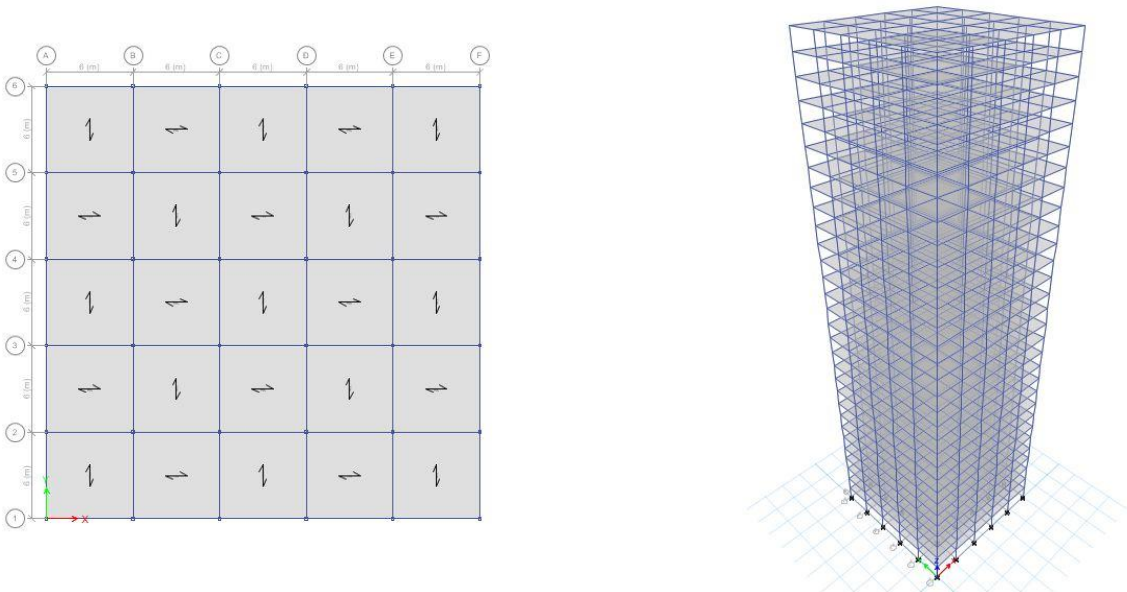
Three-dimensional view and floor plan of the 30-story building frame.
